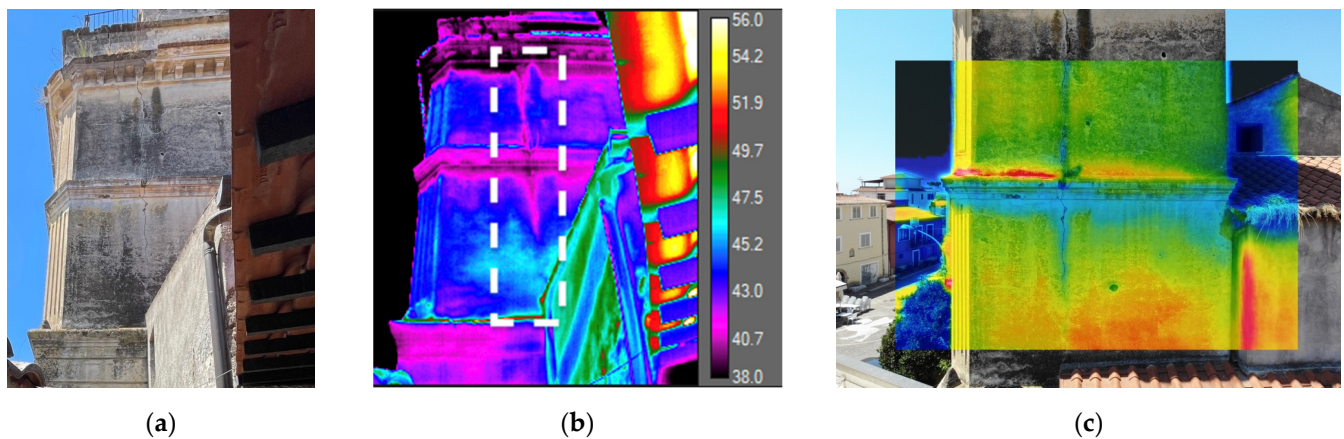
Cracking phenomenon observed on the east façade: (a) photo of the external wall and inspection with thermal imager from ground (b) and with drone (c). The vertical crack is highlighted in white.
